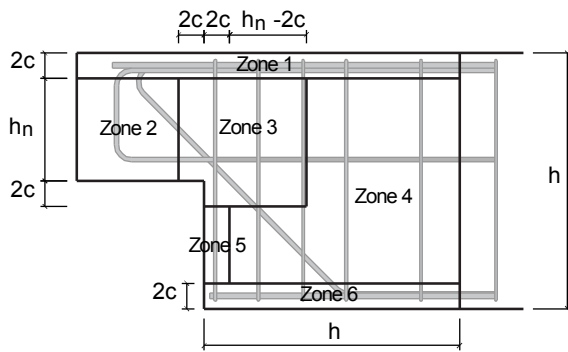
Example of zonation within a half-joint detail to facilitate inspections
